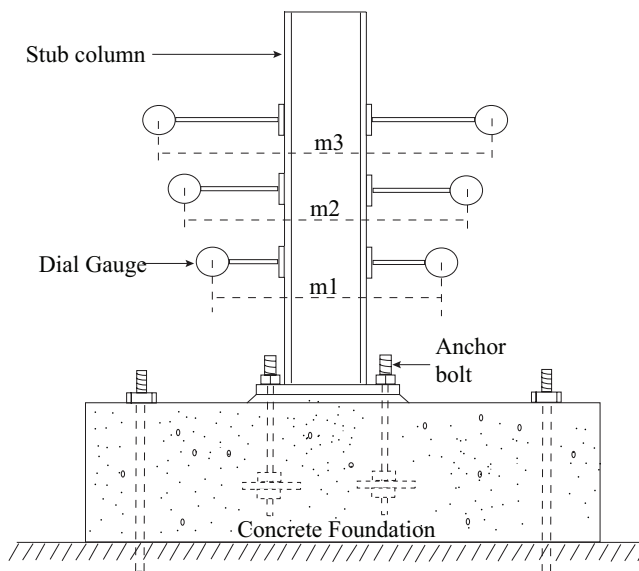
Test Specimen (Picard and Beaulieu 1985)
